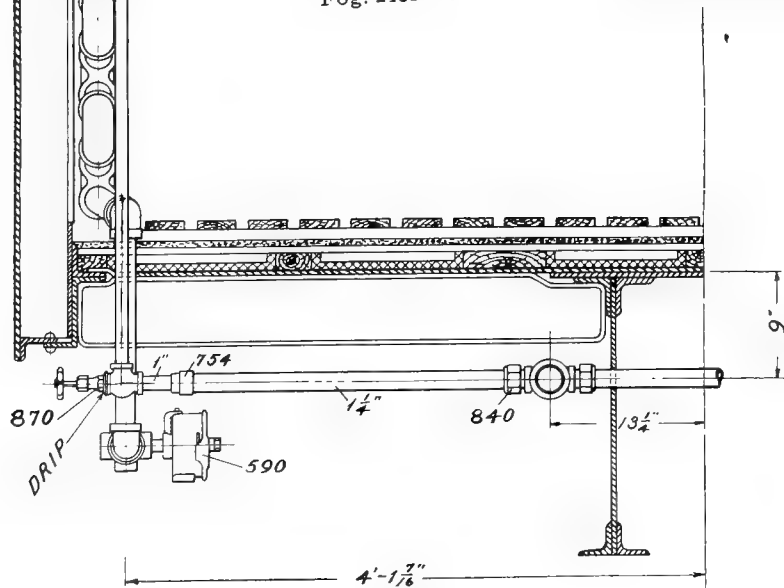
Application of Drip Valve, No. 870, to Express Car.
